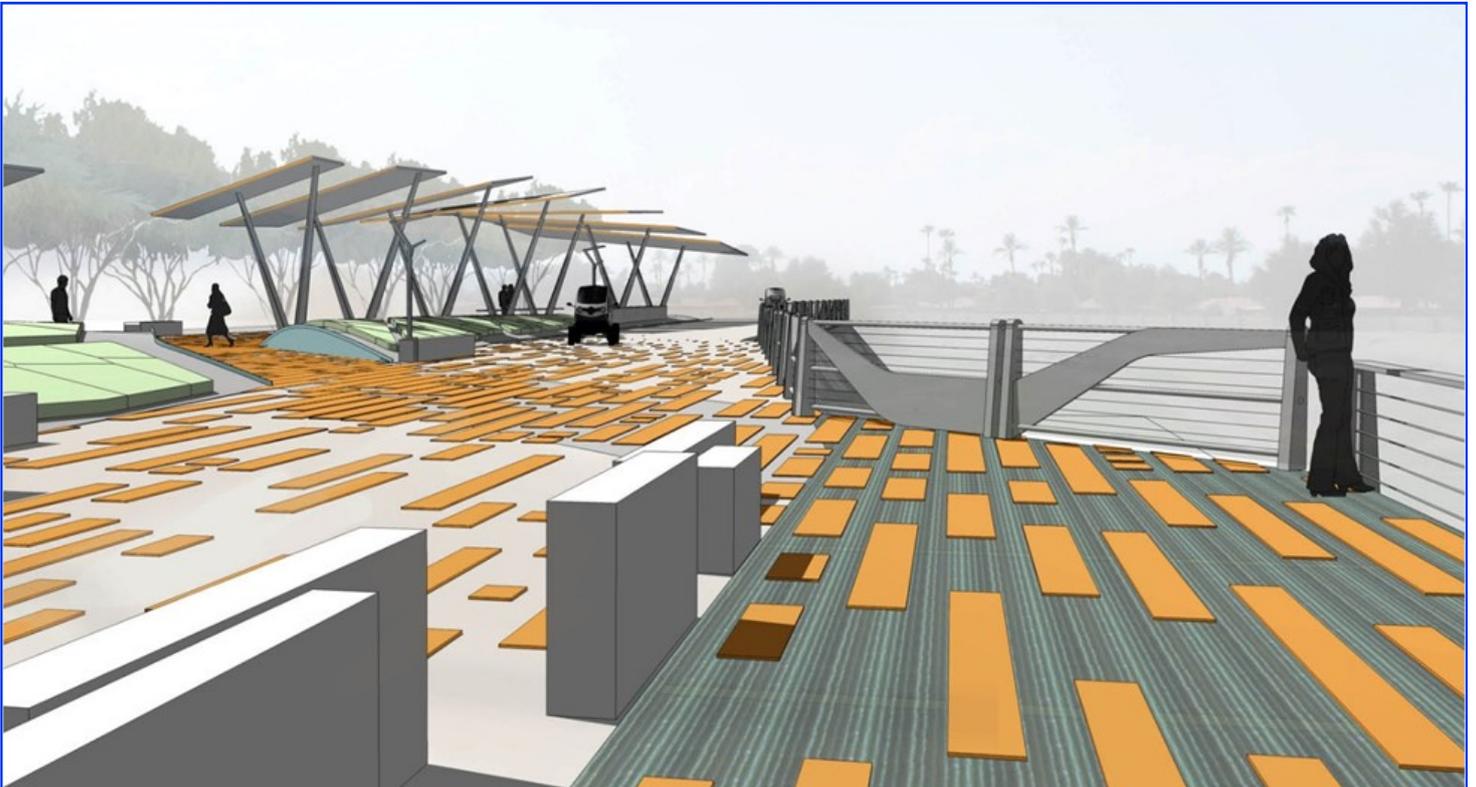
CV Link design sketch showing shade and solar structures (source: Alta Planning + Design).
